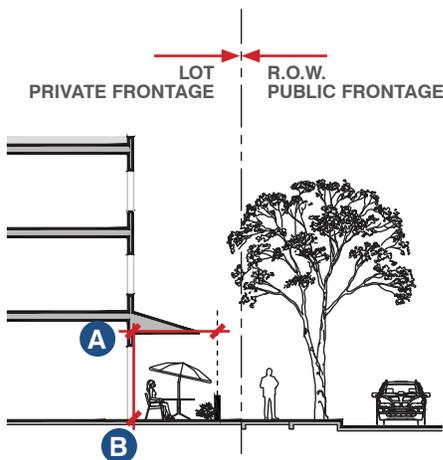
FIGURE: RESIDENTIAL GROUND FLOOR PATIO FRONTAGE SECTION
